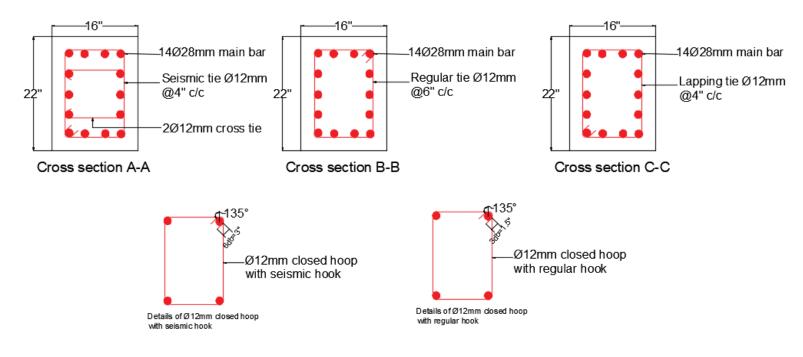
Details of Cross Sections, Ties and Closed Hoops
